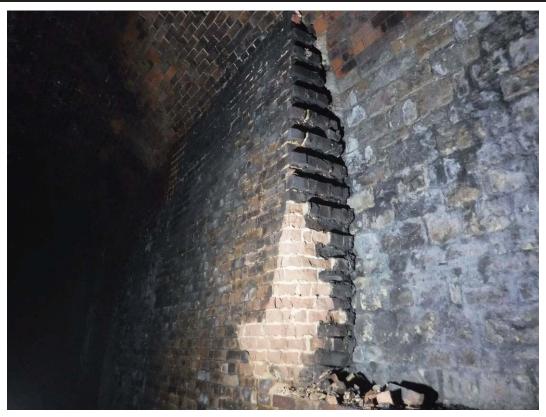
102+01 Sidewall Down, Brickwork, spalling to corner of support brickwork, depth 200mm, area 1sq.m. with a 5m long diagonal fracture, width 3mm.
